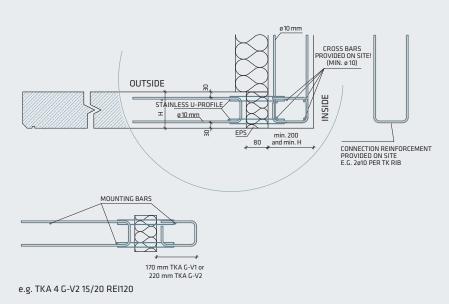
Balcony connection – wall above with TKA G-V1 or V2  $\,$
